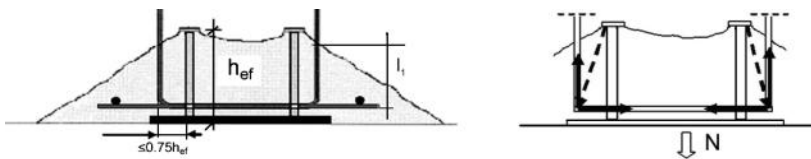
Example for a multiple fastening with supplementary reinforcement to take up tension loads and corresponding strut and tie model
